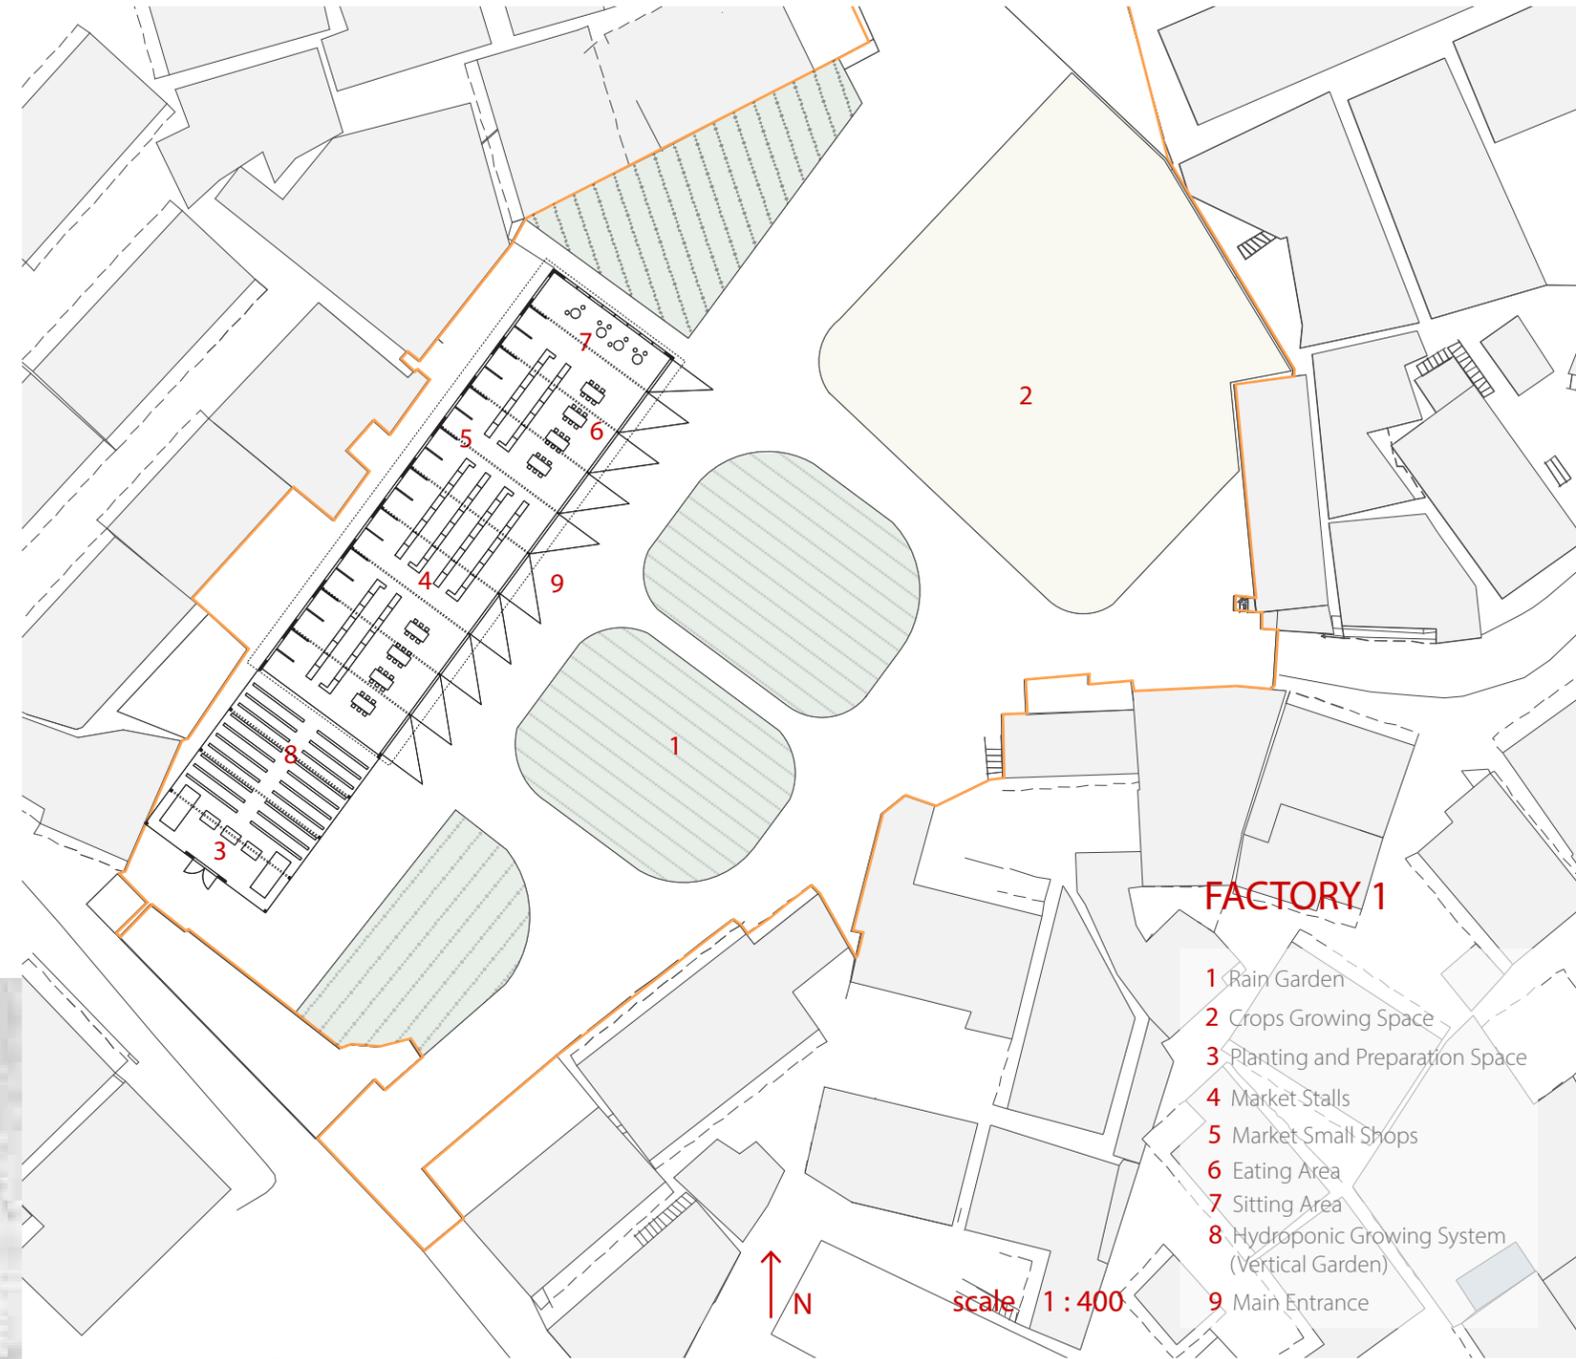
Proposed Floor Plan of Factory 1, photo by author
